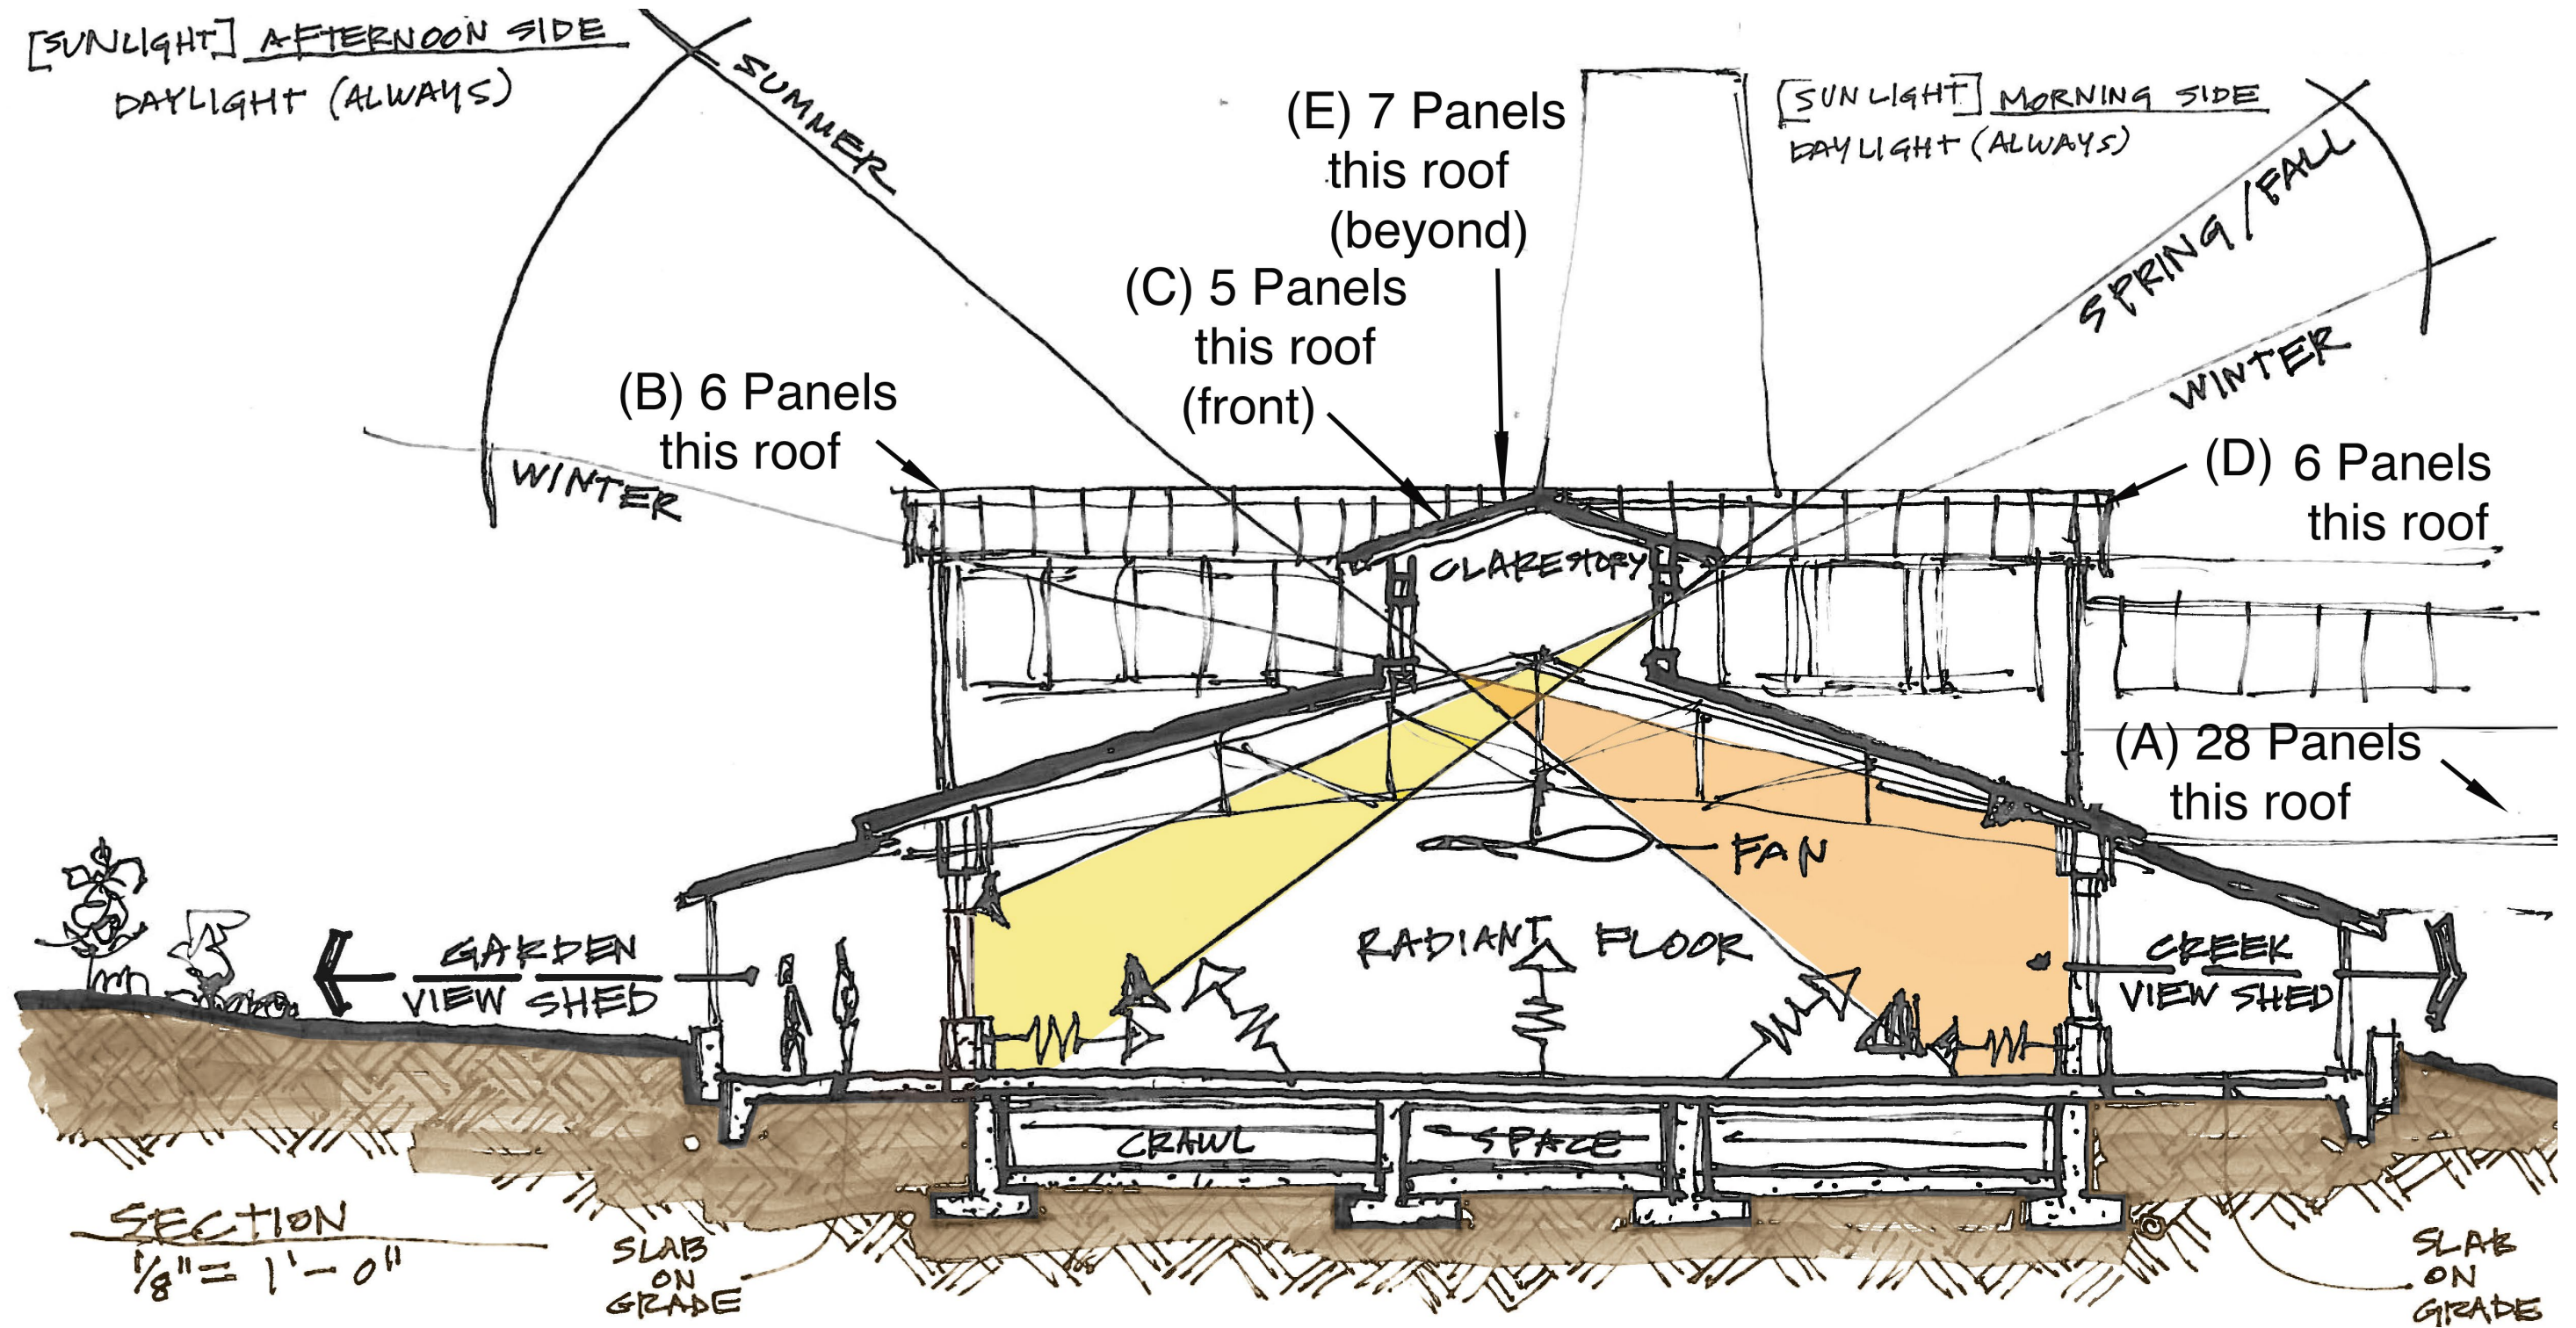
Sketch showing SSW and NNE section elevation with typical daylighting and roof provisions for Solar Arrays – by J. Nicholson. 2015.
